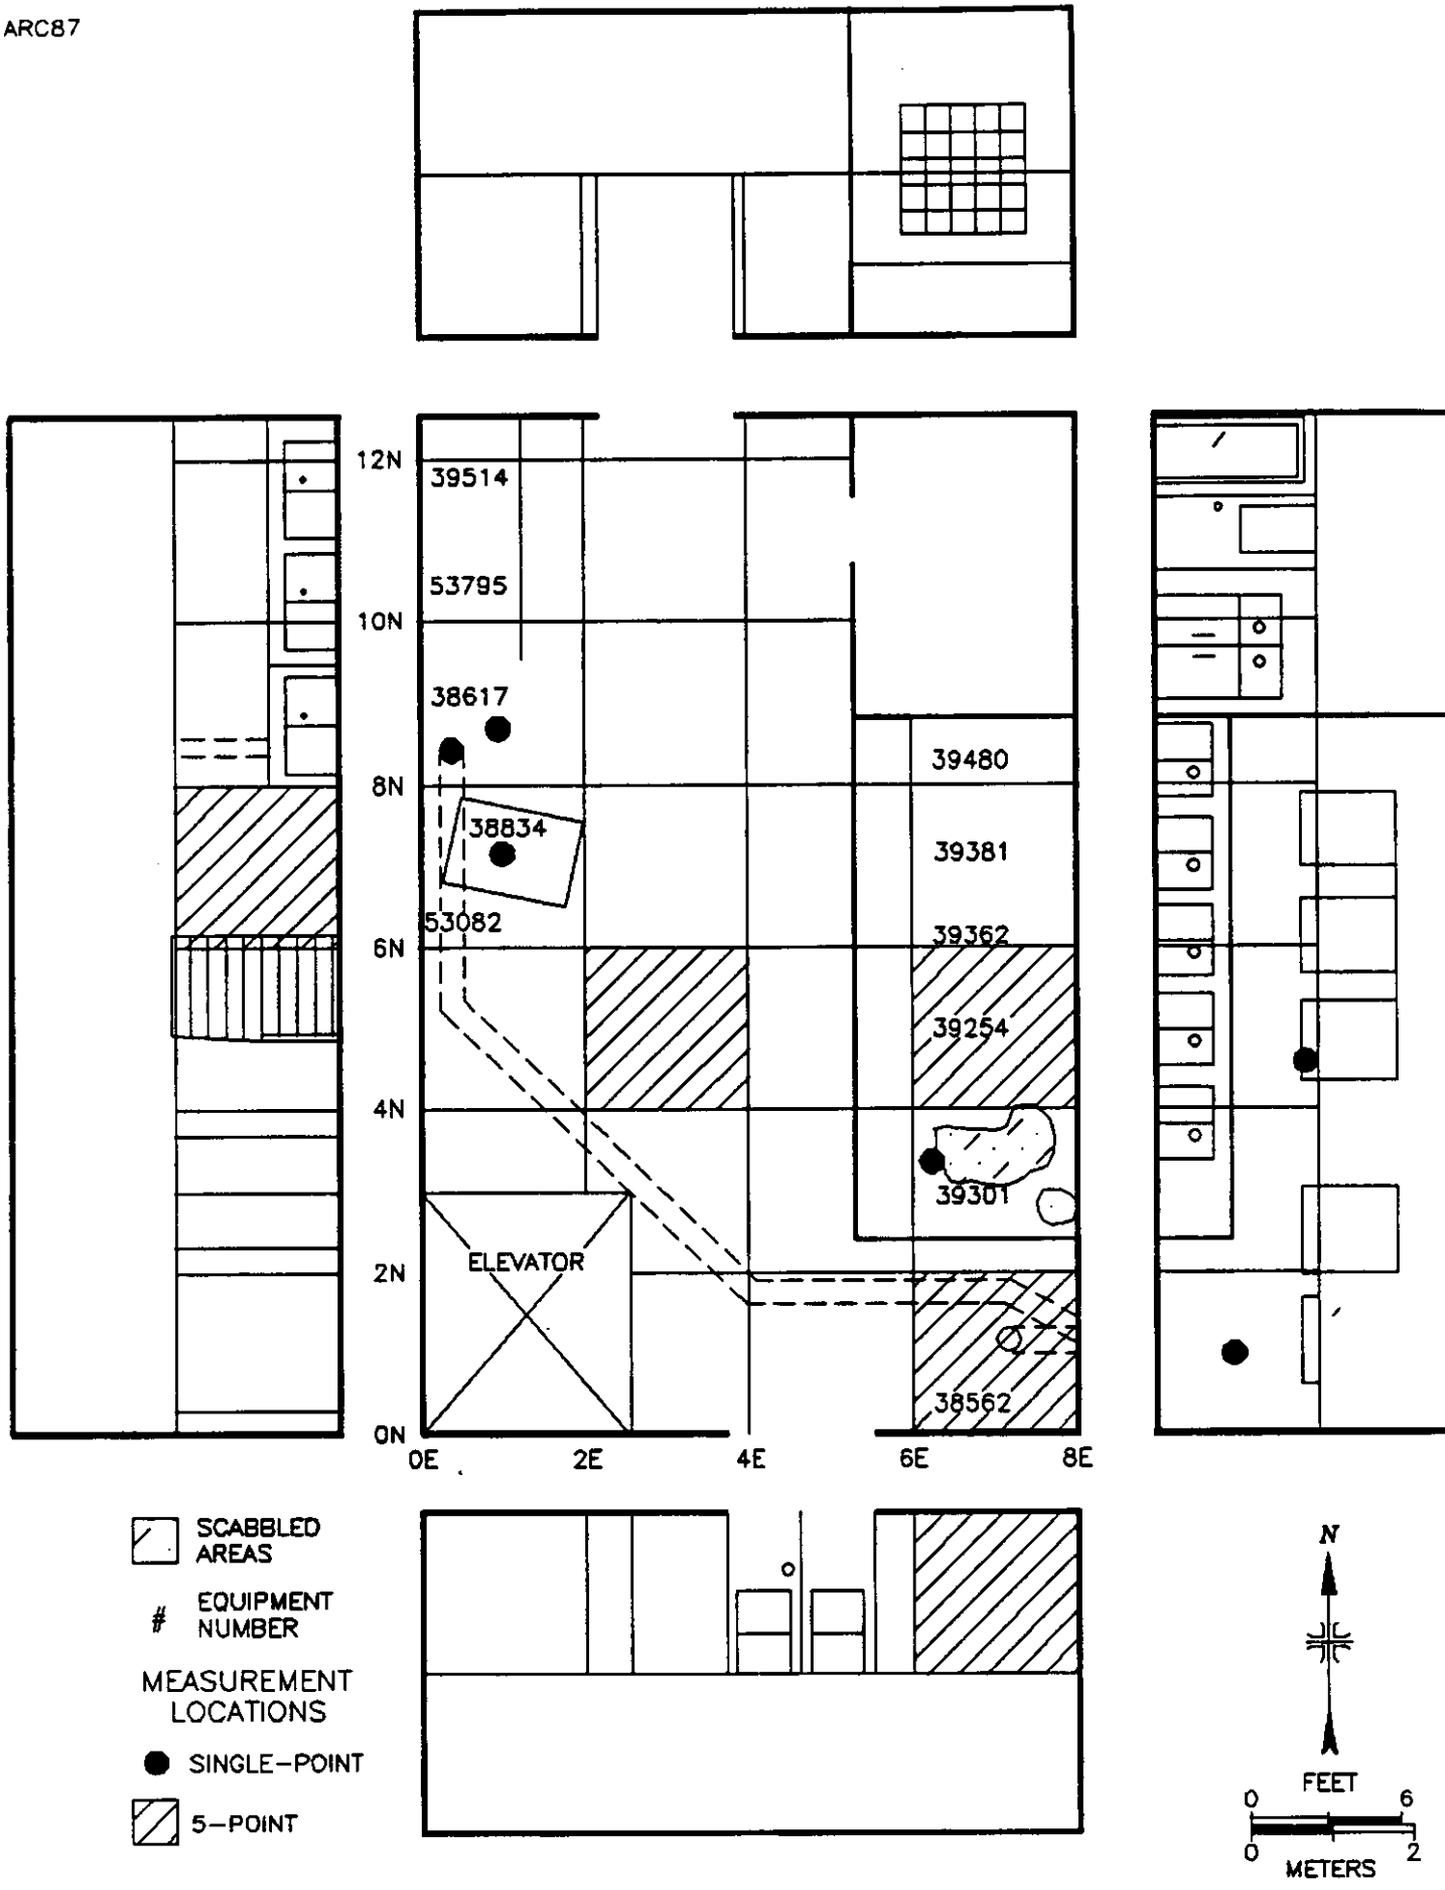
ARC Building 23, Crusher Room, First Floor
